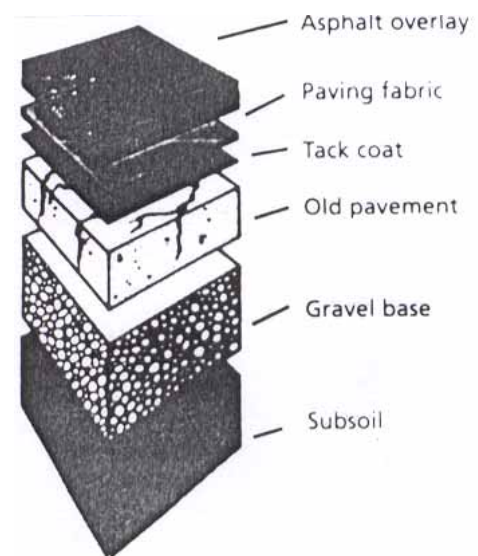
Typical cross-section of a paved road with a paving fabric interlayer (after Barazone, 2000)
